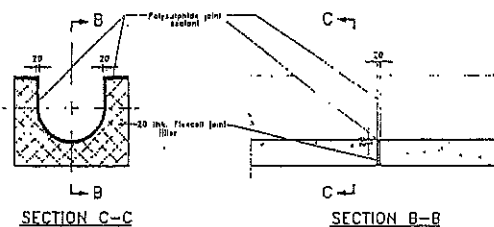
DETAILS OF PIPE SEWER UNDER BOX CULVERT
